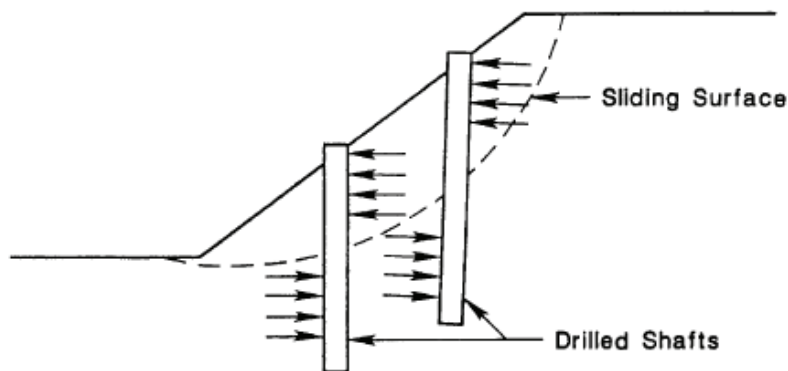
Drilled Shafts for Stabilizing a Slide (Reese et al., 1987)
